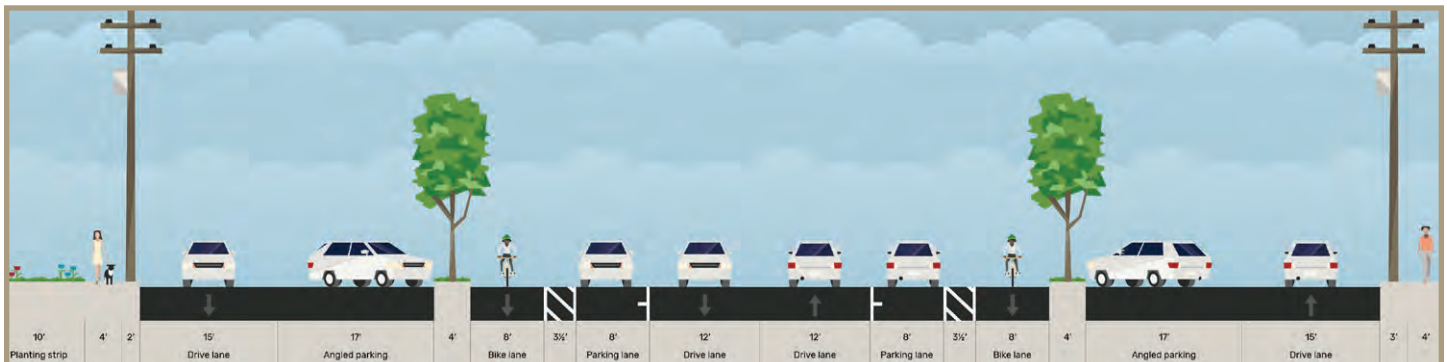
A cross section of Central Avenue, between Lincoln Avenue and Franklin Avenue, with a proposed road diet.
